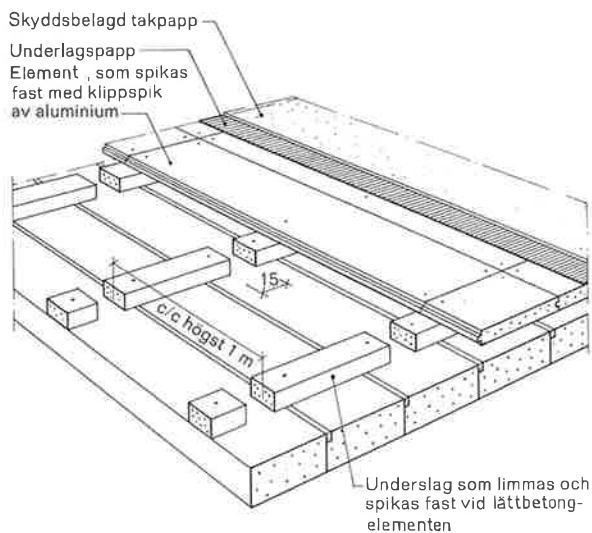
The ventilated flat roof structure with 20 cm self-supporting cellular concrete elements and with 7 cm top elements of cellular concrete. The air space is achieved using 7 cm spacer blocks of cellular concrete. The air space has openings at the walls connecting it to the outer air.
